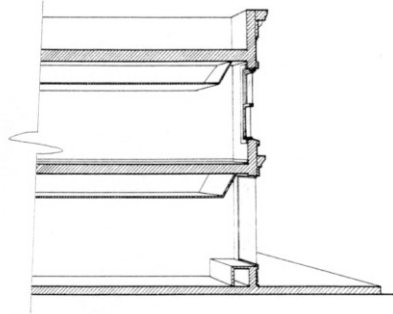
Slope interior ceilings to allow full window height to be unobstructed.
